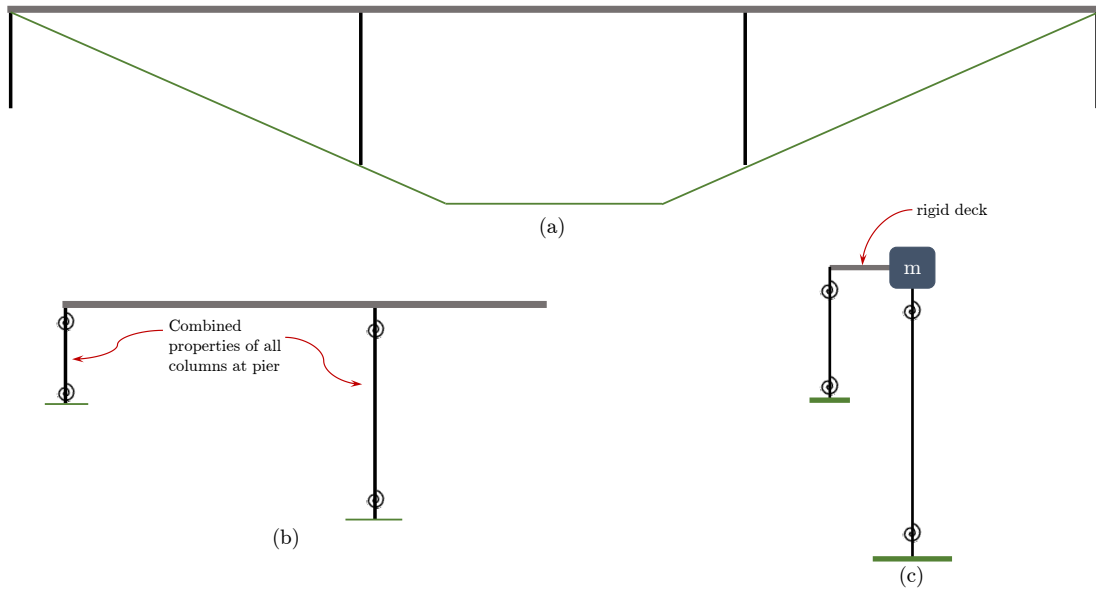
(a) idealization of Bridge 1, (b) reduction to essential sections, and (c) model
